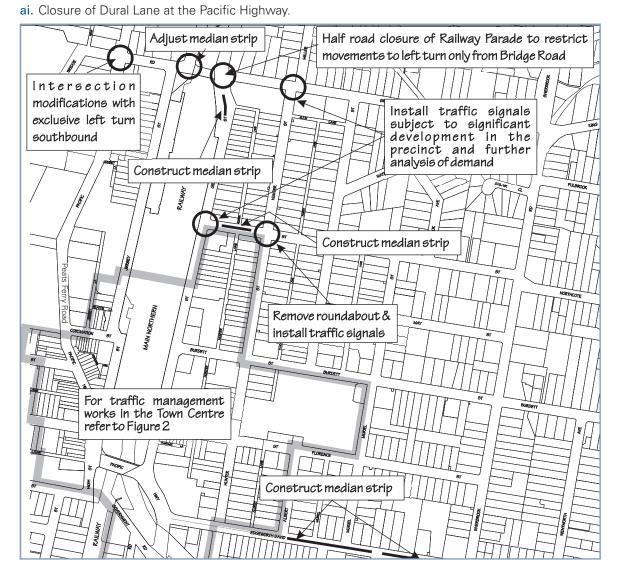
(ab): Traffic Management Improvement Plan - Figure 1. (C)
